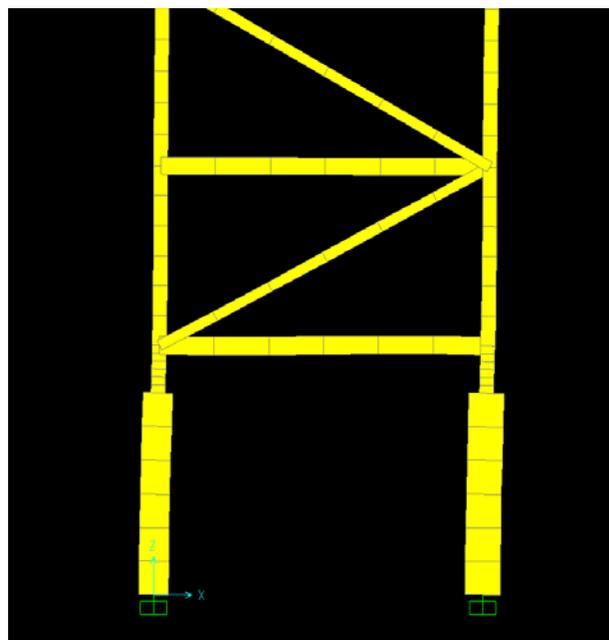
Close up view of concrete piers transmitting shear from the column and into the footing.
